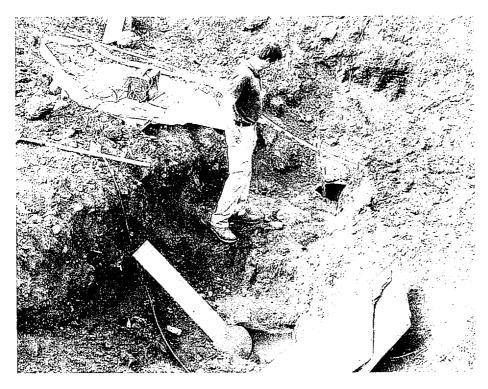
Cross-Over Line Between Intake Tunnel to Spray Pond
